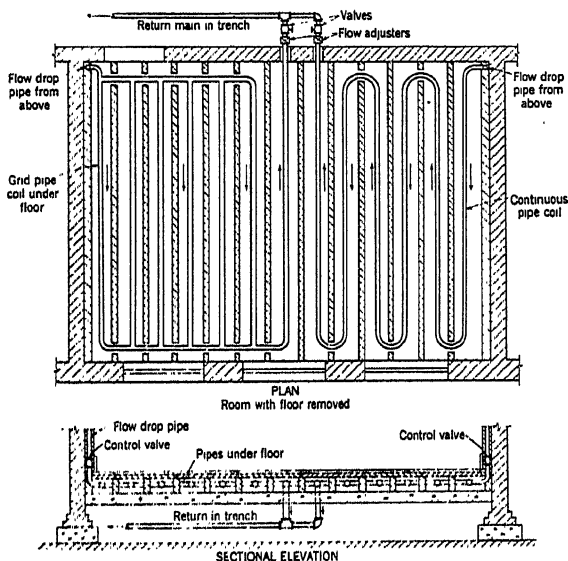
ARRANGEMENT OF CONTINUOUS PIPE COIL IN FLOOR CONSTRUCTION
